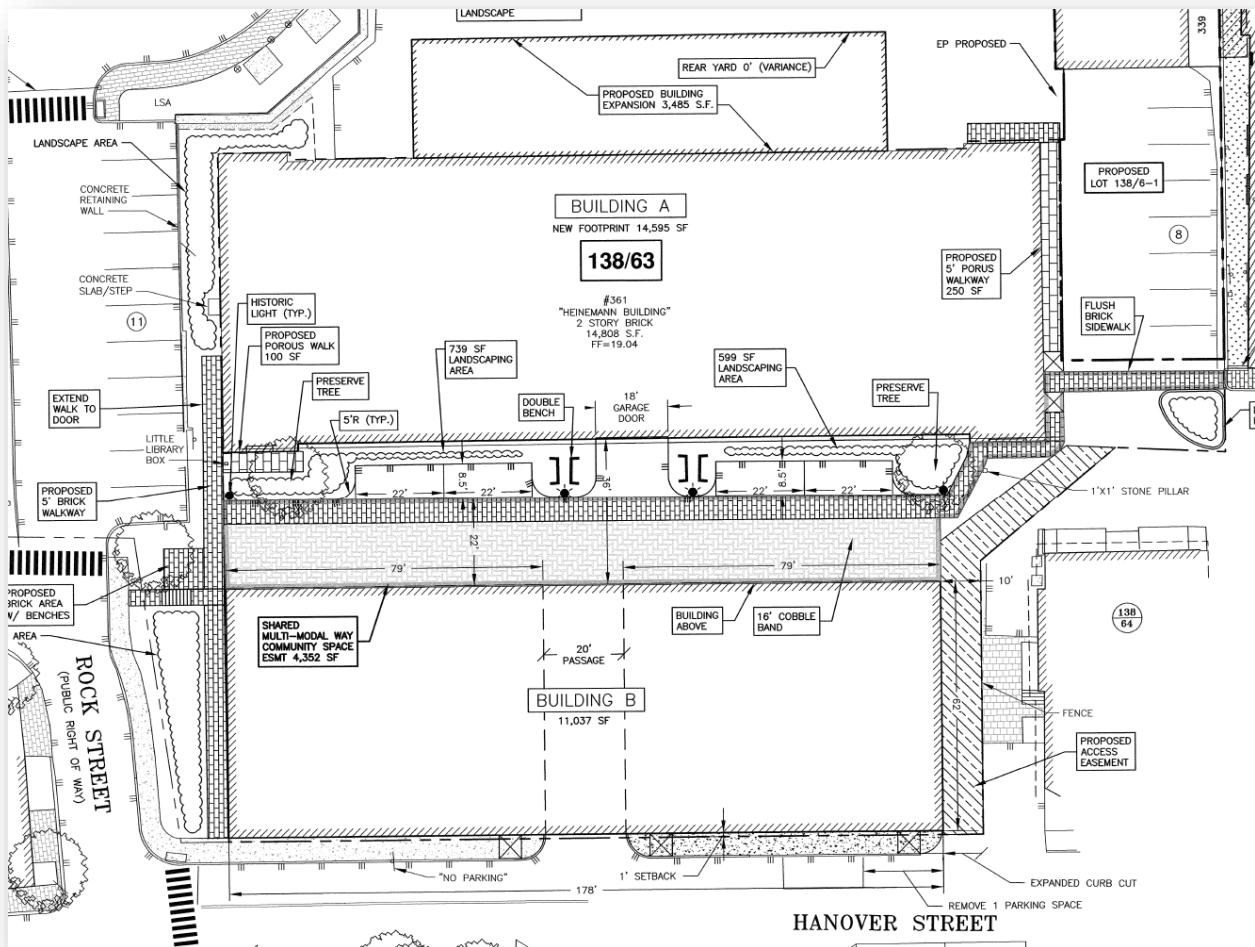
Site Plan of the Recently-Approved Design Review Plan (May, 2024)
